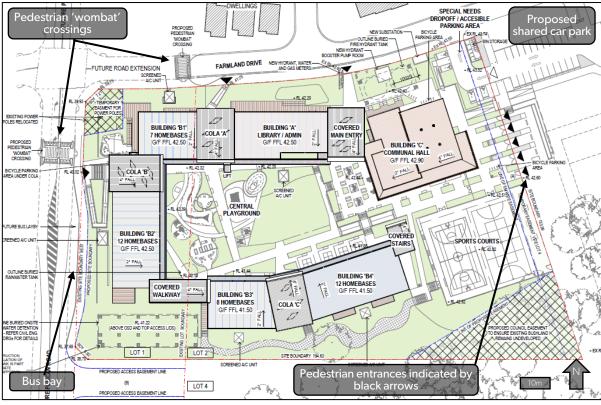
| Proposed site layout (Base source: Applicant's SRtS2 2020)
